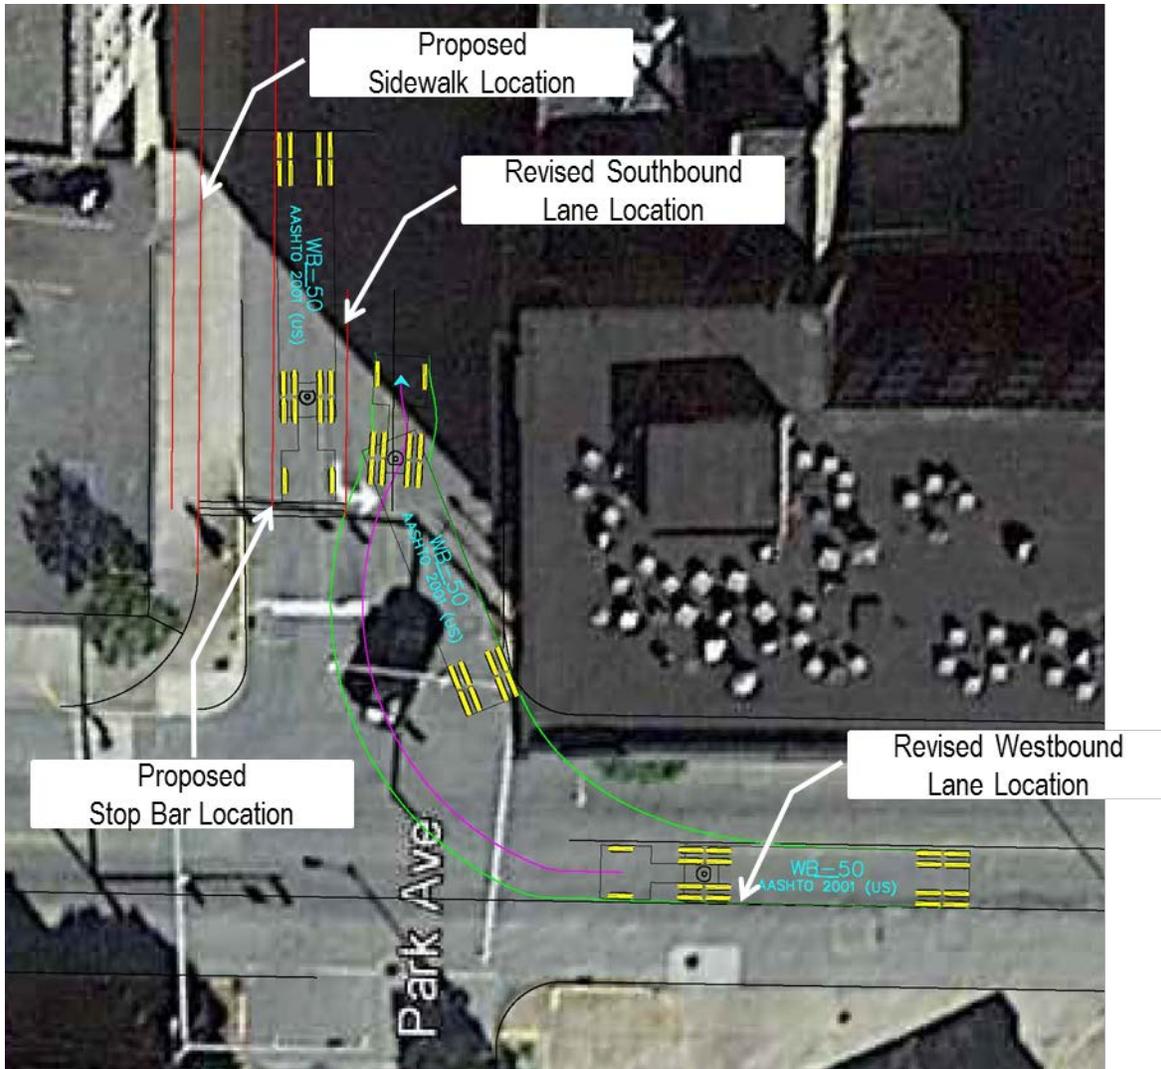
Recommended improvement for Park Ave. and 2nd Street Intersection
